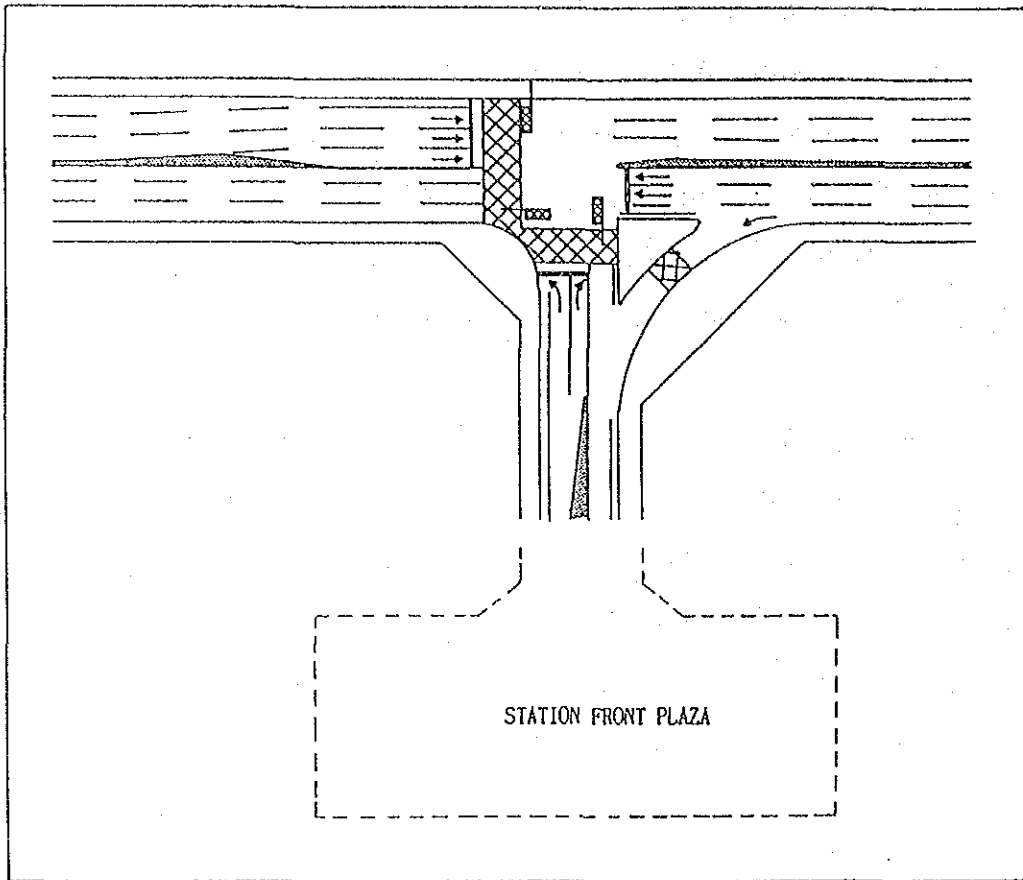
Proposed Traffic Control System and Access Road
